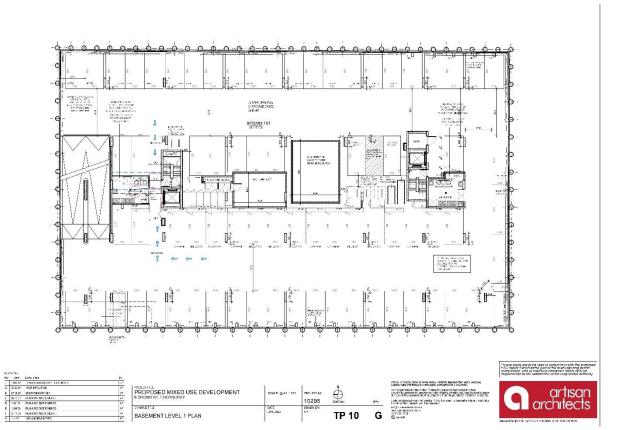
Parking Layout: Basement Level 1 (plan No. TP 10 G by artisan architects)
